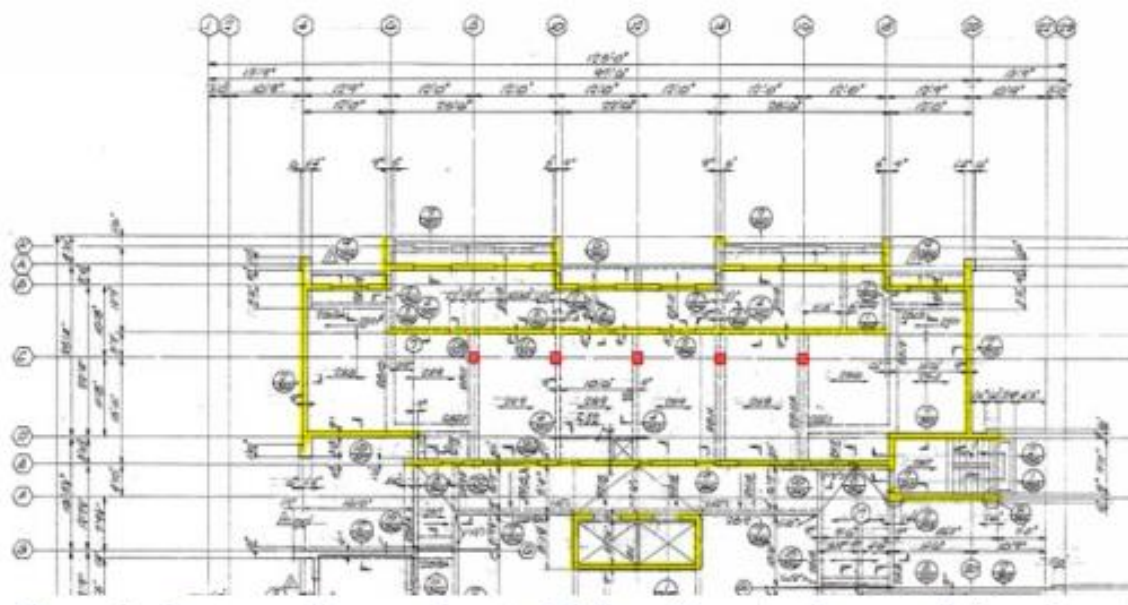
Working Group 3 shear wall first floor plan (red squares are the columns while the yellow shaded areas are the shear walls).
